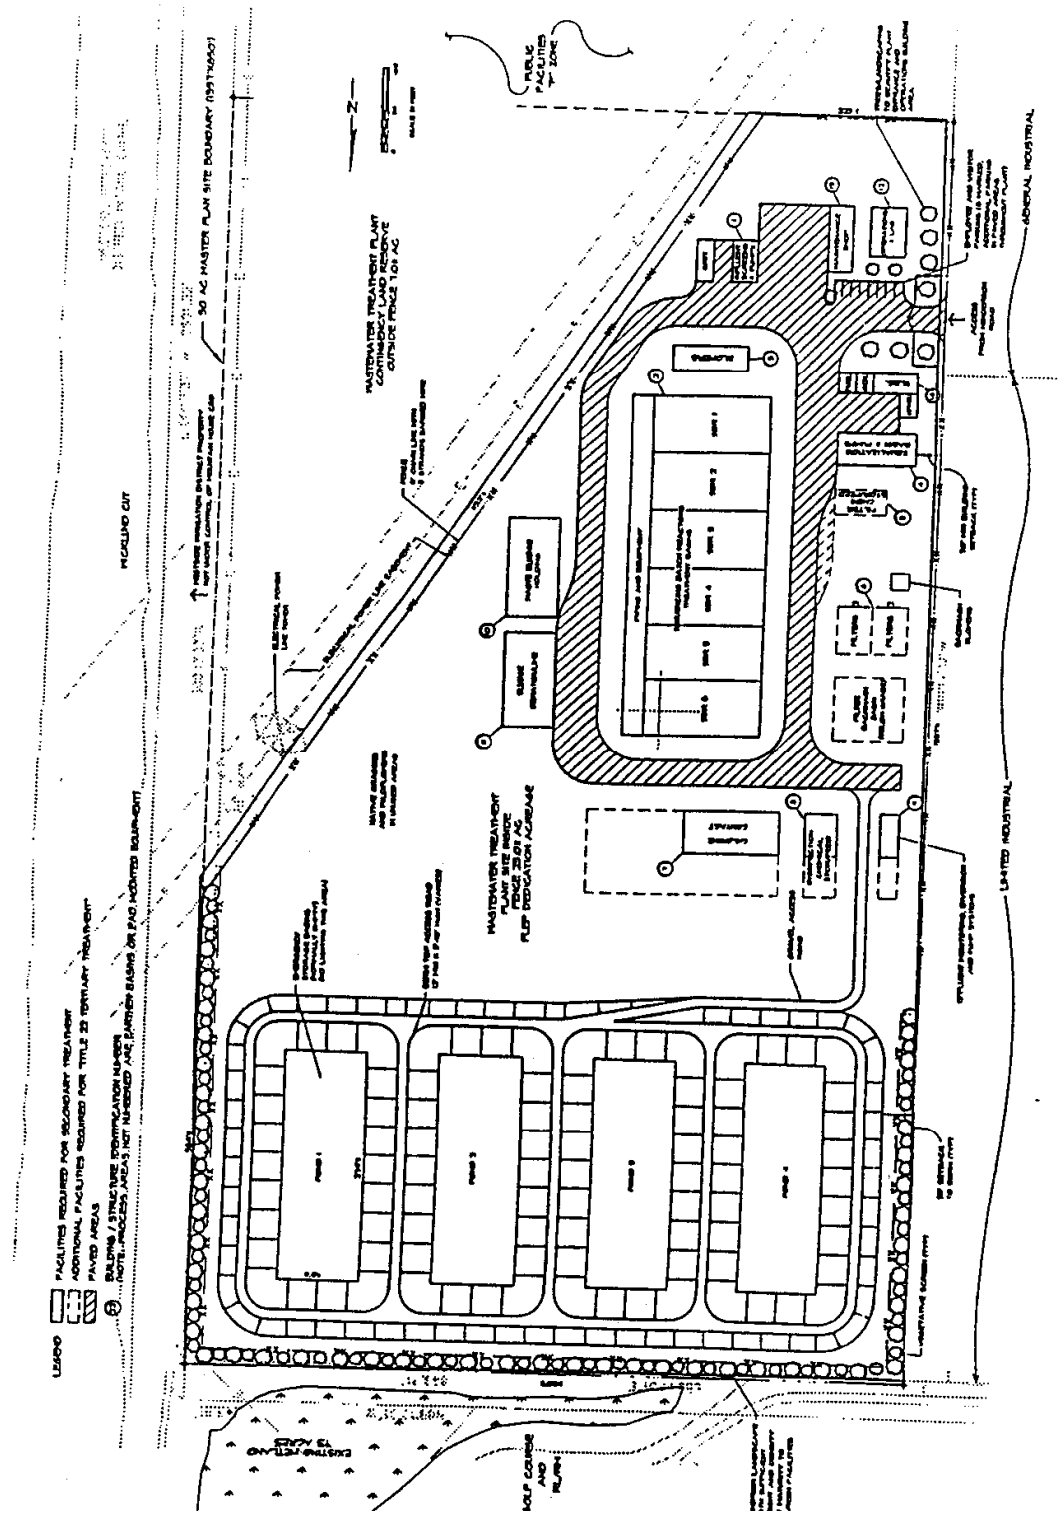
WASTEWATER TREATMENT PLANT SITE LAYOUT
